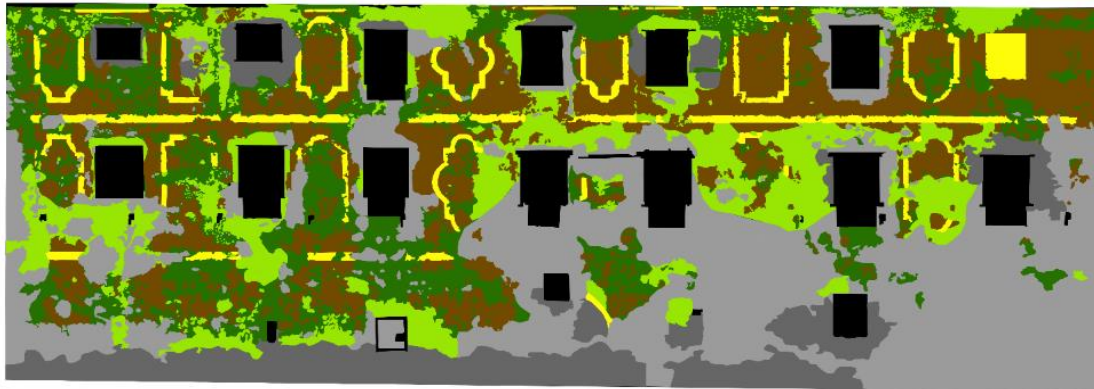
Section of the façade; due to the different reflectance of the wall surfaces, structural details such as ornaments on the wall or even structural damage can be seen very well
